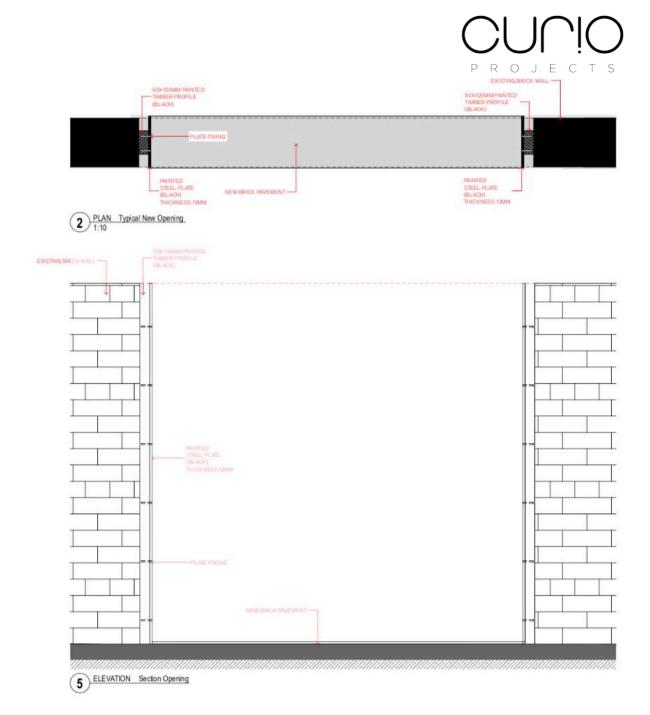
Proposed Plan and Section of new penetrations (Source: FJMT 2019, DA-5002, SSDA01, Heritage Wall Details, 18.12.19)
